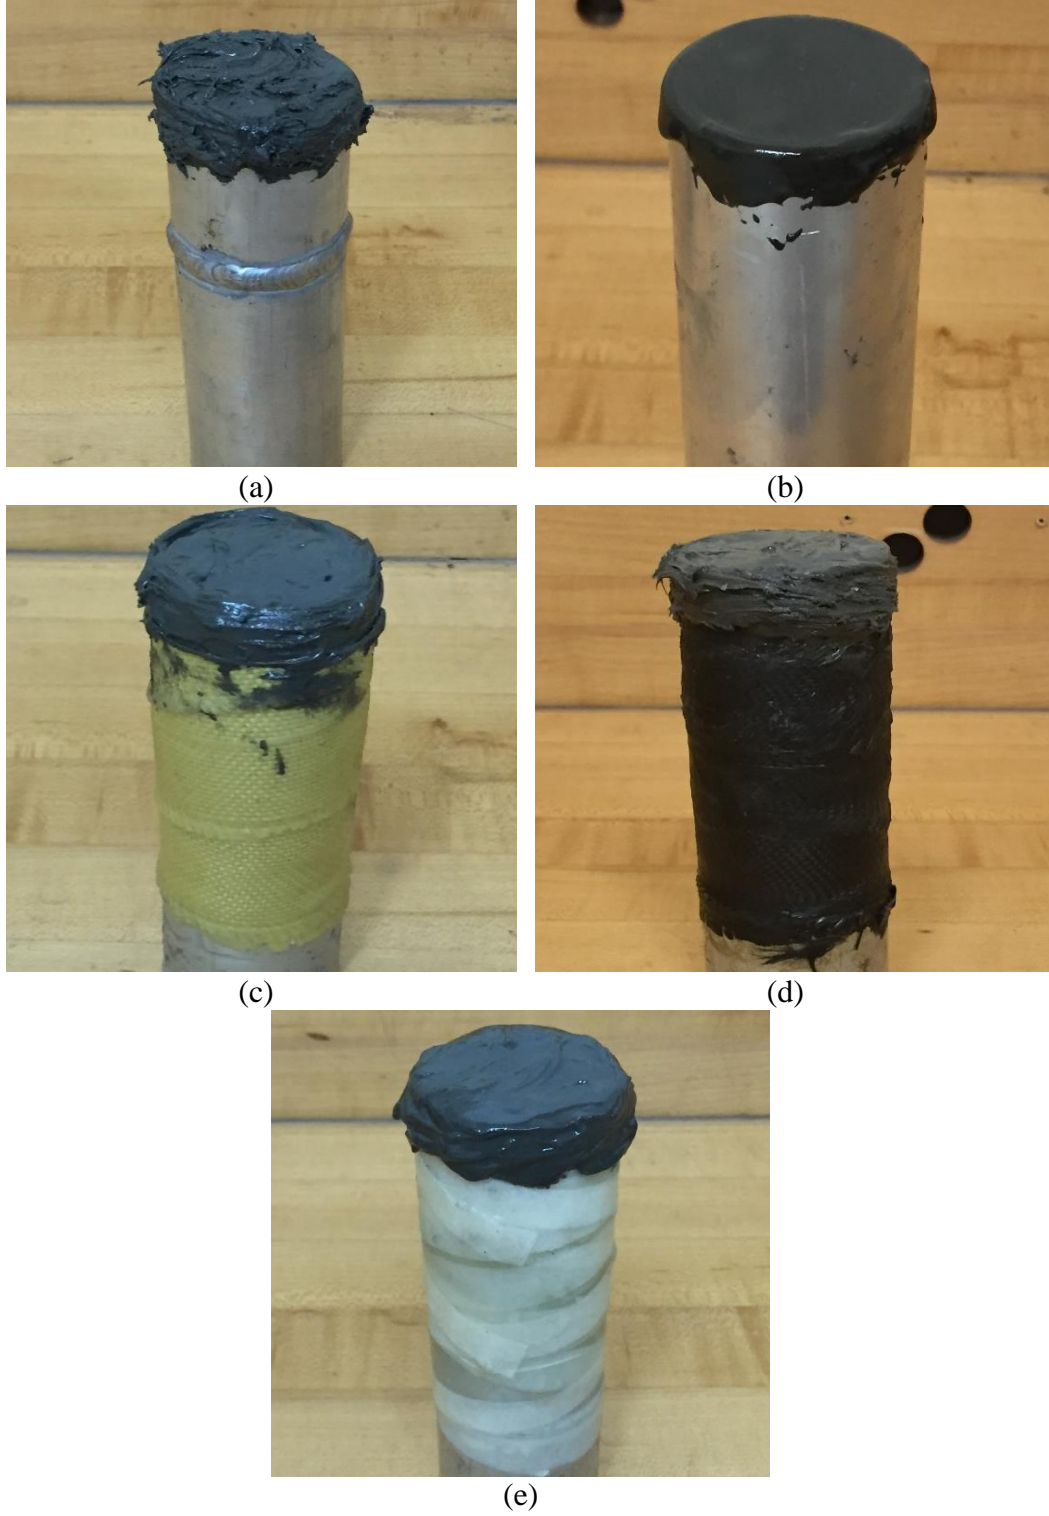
Specimens before corrosion experiment, (a): Welded aluminum pipe, (b): Non-welded aluminum pipe, (c): KFRP, (d): CFRP and (e): GFRP.
